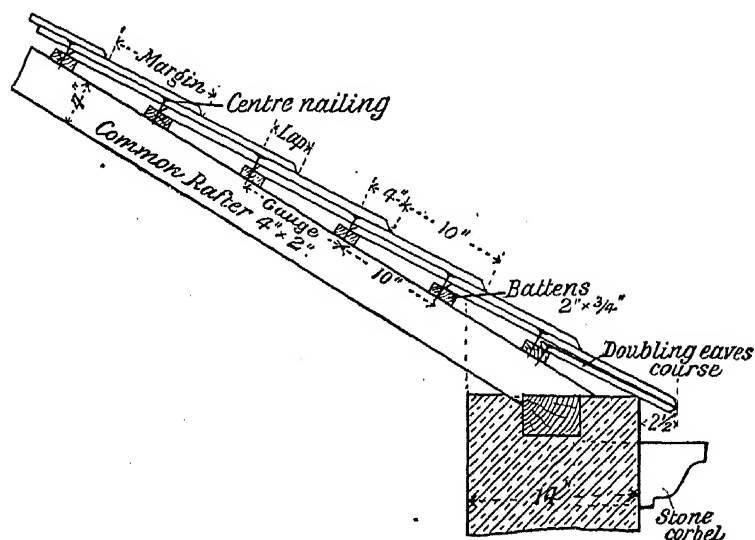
Section through *AB*, Fig. 379, showing the Eaves of a Roof covered with Duchess Slates laid on Battens to a 4" Lap.
